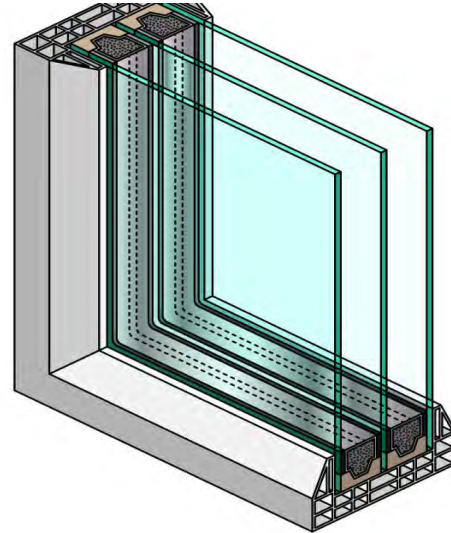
Energy Efficient Windows (Source: Buying Guide)
